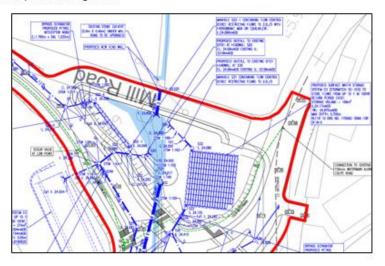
Extract of Site Services Plan (sheet 7) showing proposed upgrading of culvert under Mill Road
